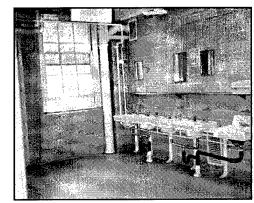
Bathroom has original plumbing fixtures, windows, floor tiles, and wall finishes; these shall be maintained.
